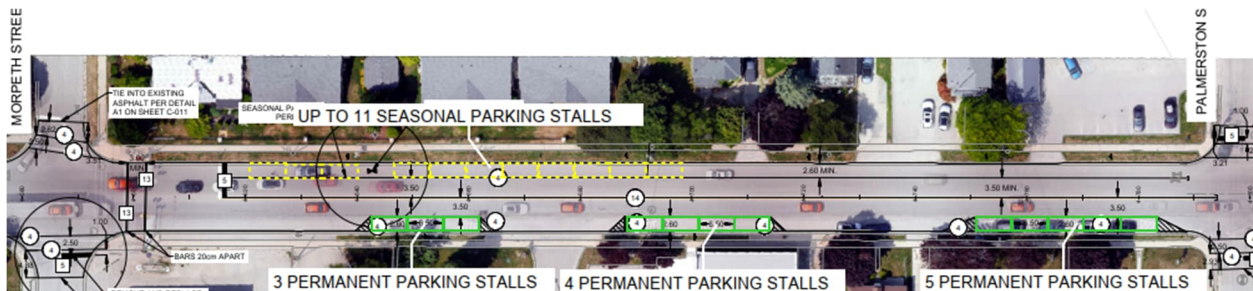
Morpeth Street to Palmerston Street Proposed Parking
